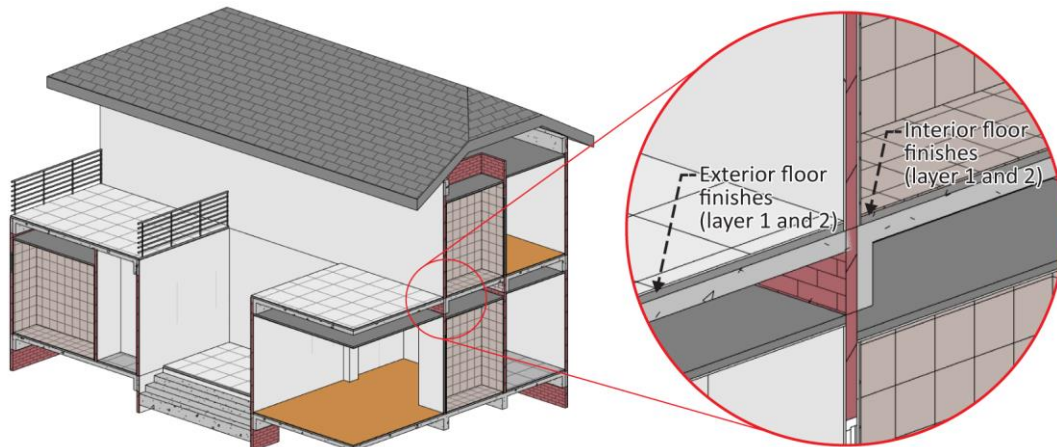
Example of the BIM model after the floors that are exterior and interior wall finishes have been recreated (process 4).
